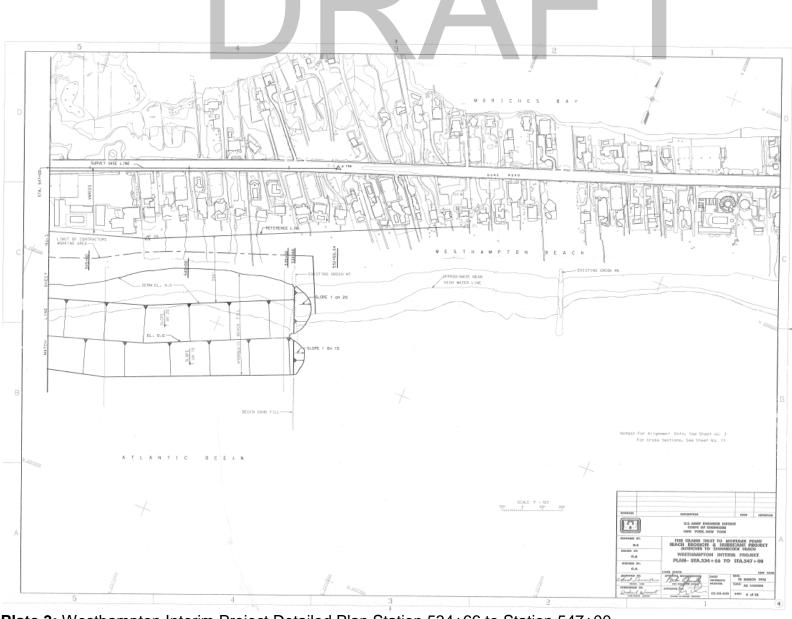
Westhampton Interim Project Detailed Plan Station 534+66 to Station 547+00
